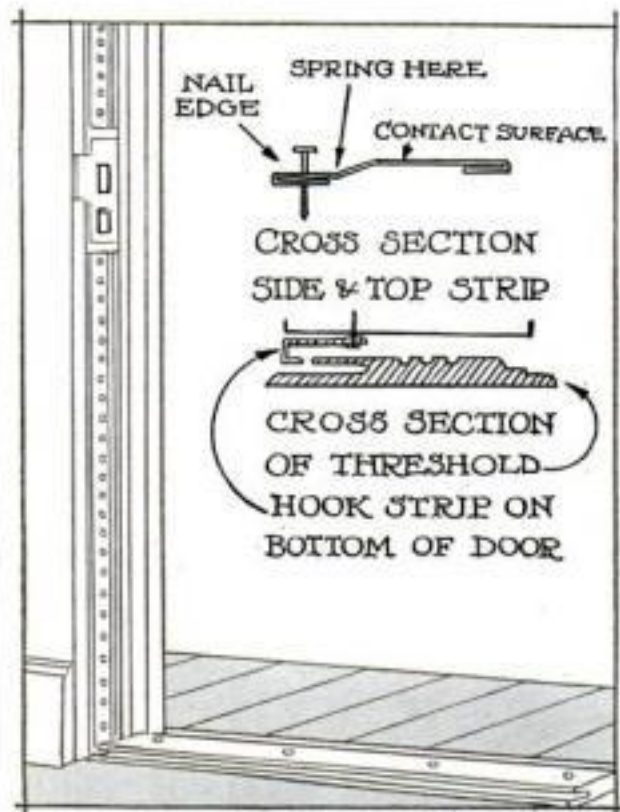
The side and top stripping and how the hook and threshold strip are arranged when the original threshold can be removed.
